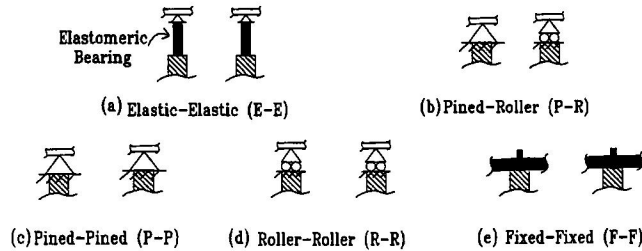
Different Longitudinal Constraints between the Deck and the Tower
